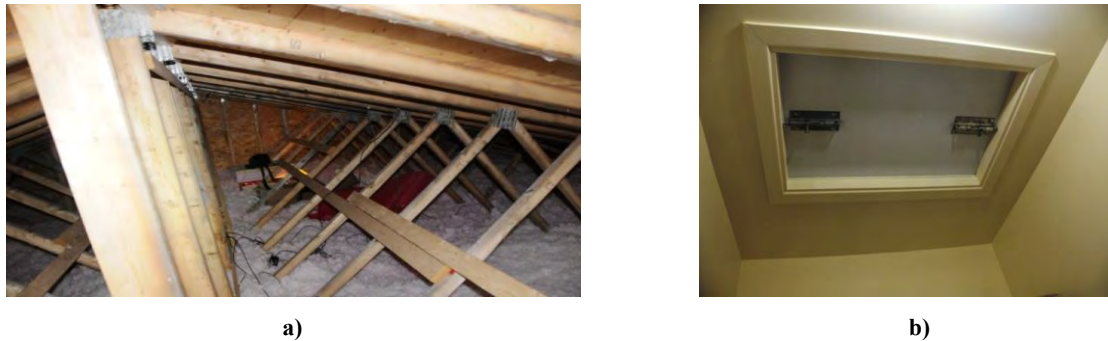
Field Observation in the Attic of House I: a) No Signs of Moisture on Building Materials and Roofing Nails not Rusted; and b) Dead Bolt Locks Installed to Ensure Hatch Pulled Tight onto Weather Stripping
